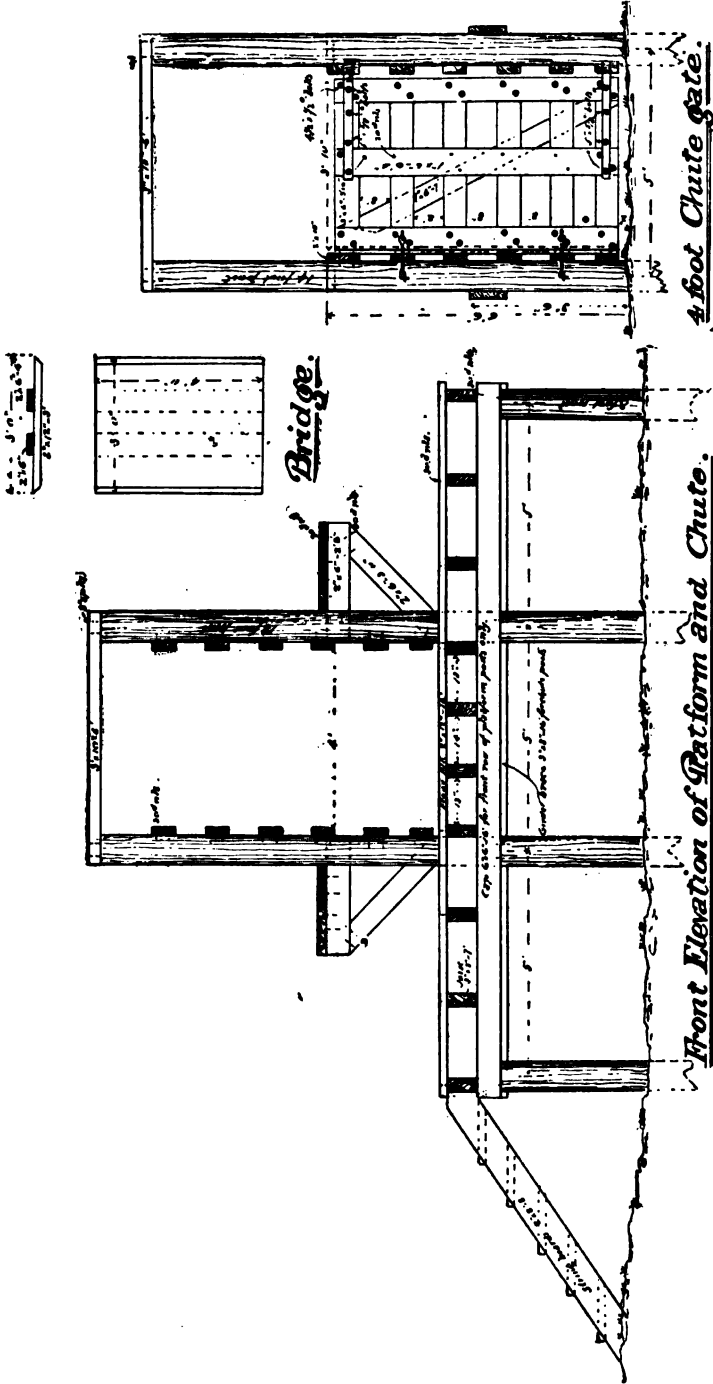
STOCK YARD DETAILS, CHICAGO, ROCK ISLAND AND PACIFIC R. R. (PLAN NO. 14.) REPORT ON STOCK YARDS AND STOCK SHEDS.
